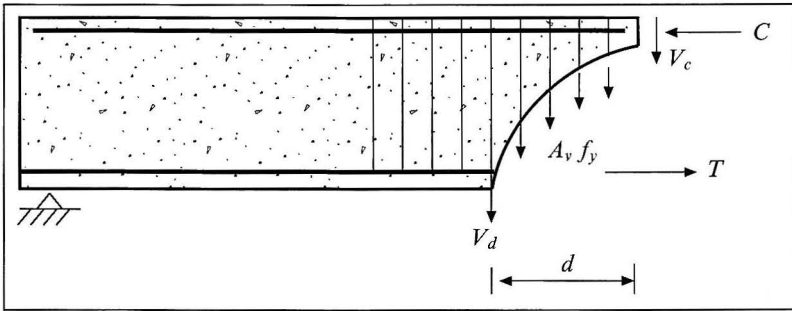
Diagonal crack with vertical stirrups.
